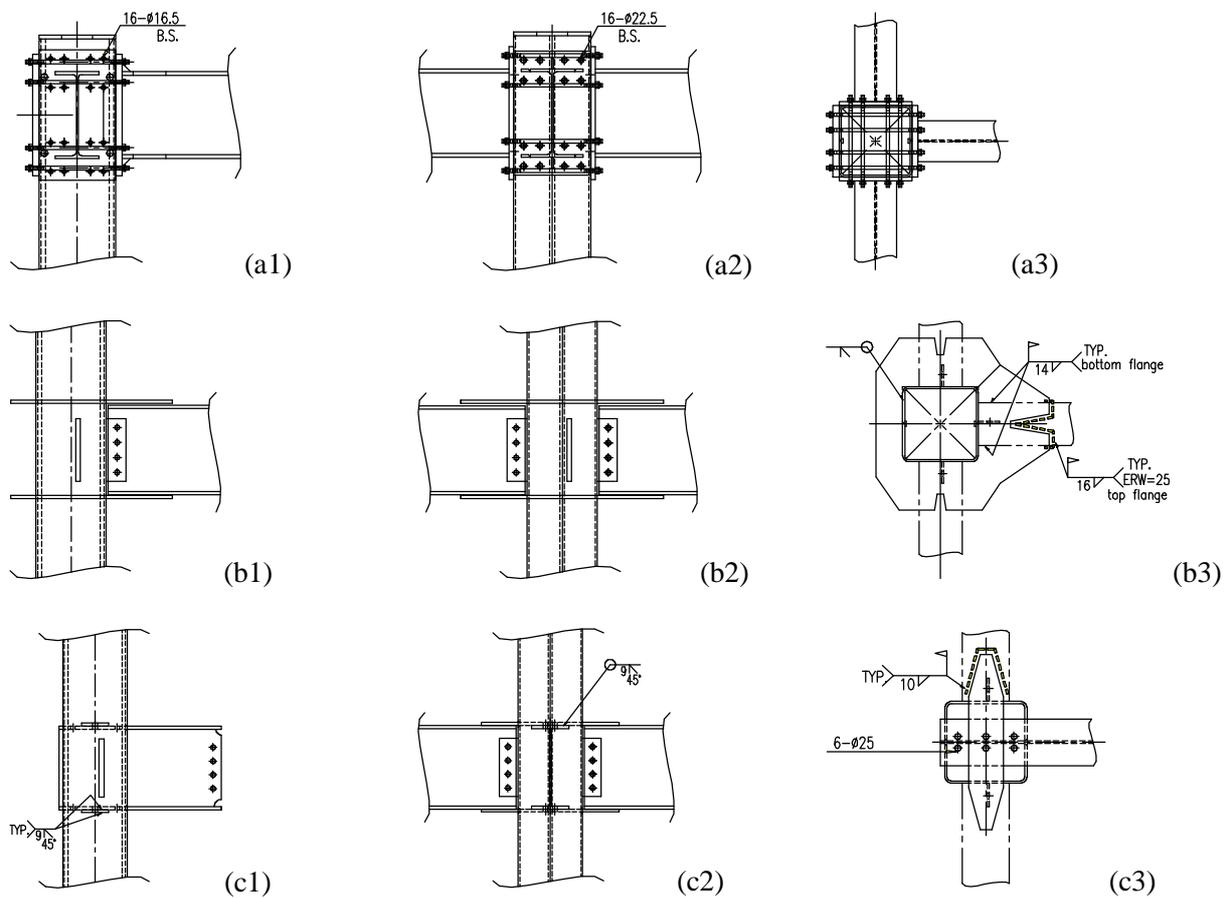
Moment connection details (a, b, c for 3rd, 2nd and 1st floor, respectively)
